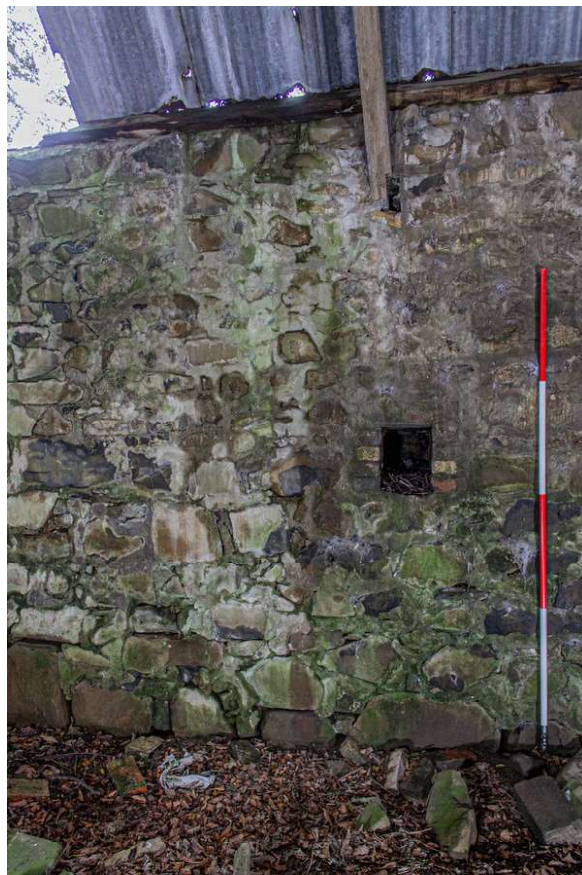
(74): Building B (Barn), Barn B5, detail of the tiny inserted opening in the north-west elevation, from the south-east
